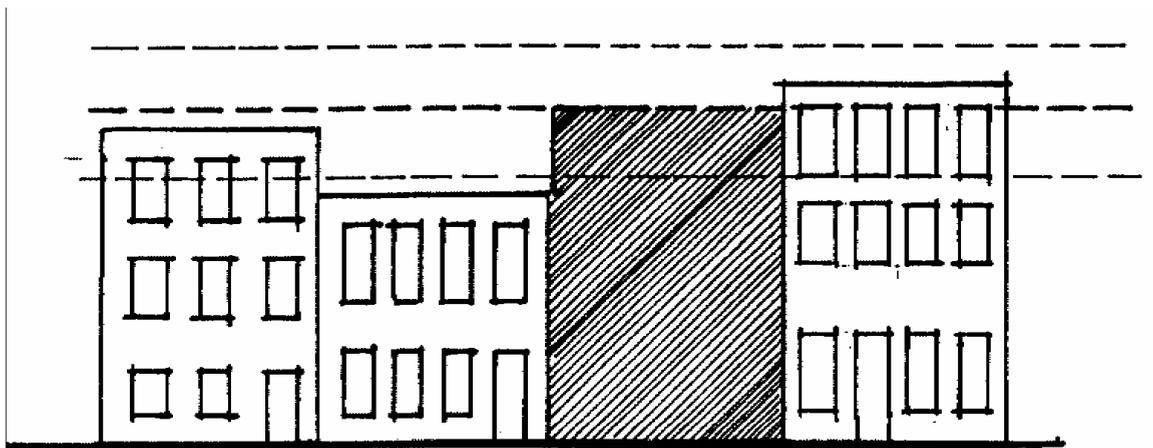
Schematic elevation sketch of a mixed-use streetscape. To create a visually unified streetwall, buildings should be no more than 30% taller or 30% shorter than the average building height on the block.
